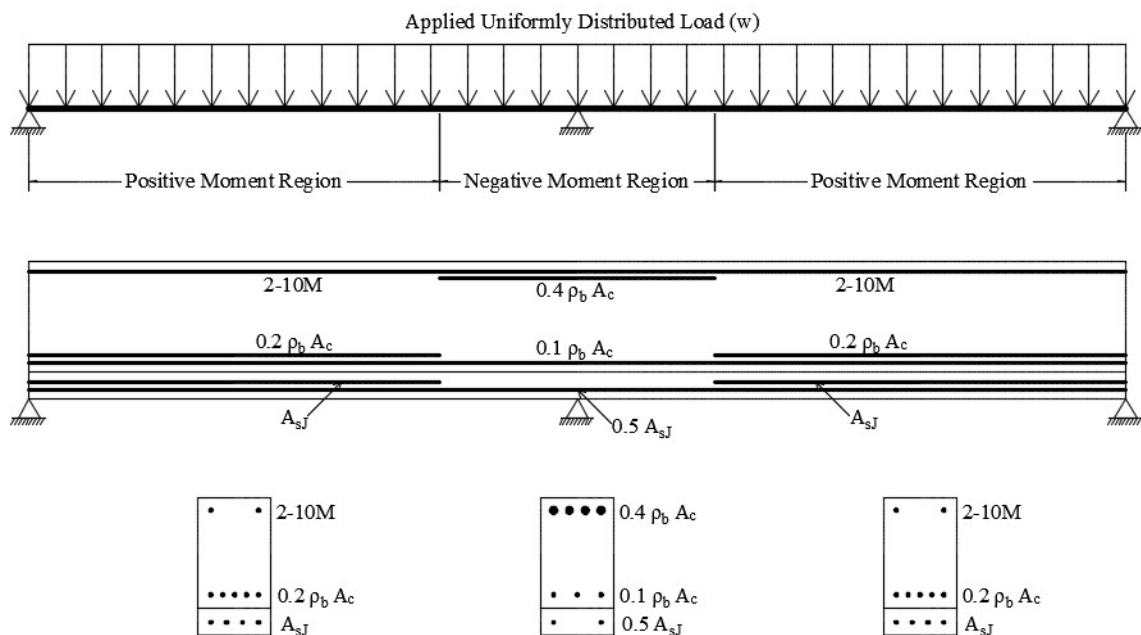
Continuous beam loading scheme and reinforcement configuration
